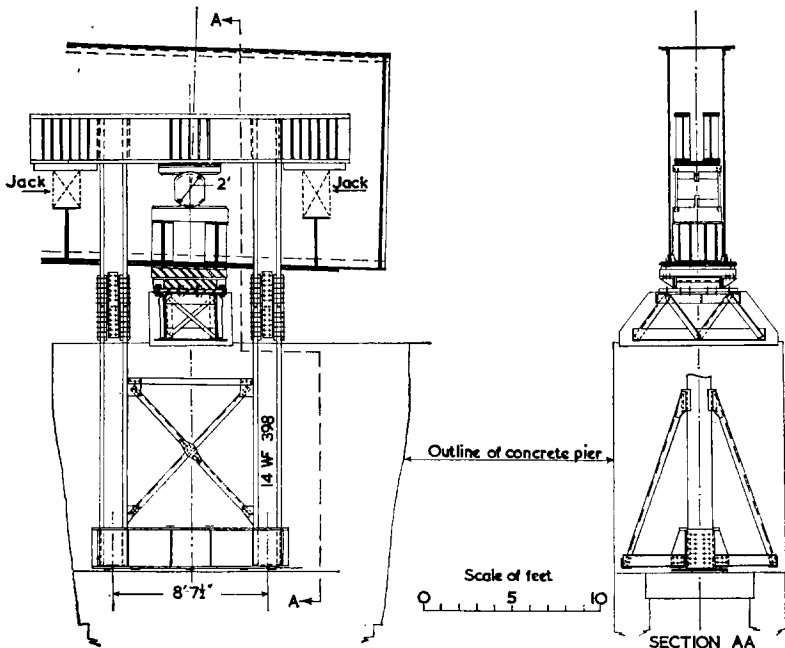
TIEDOWN ARRANGEMENT AT ANCHOR PIERS
